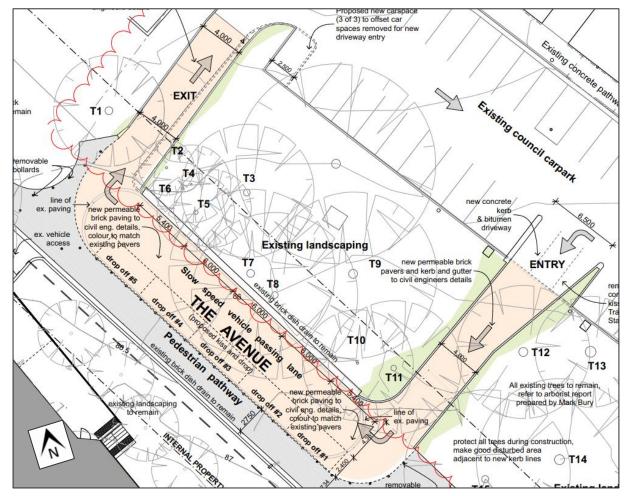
| (Source: Proposed driveway and roadworks within The Avenue (Applicant's SRTS)
